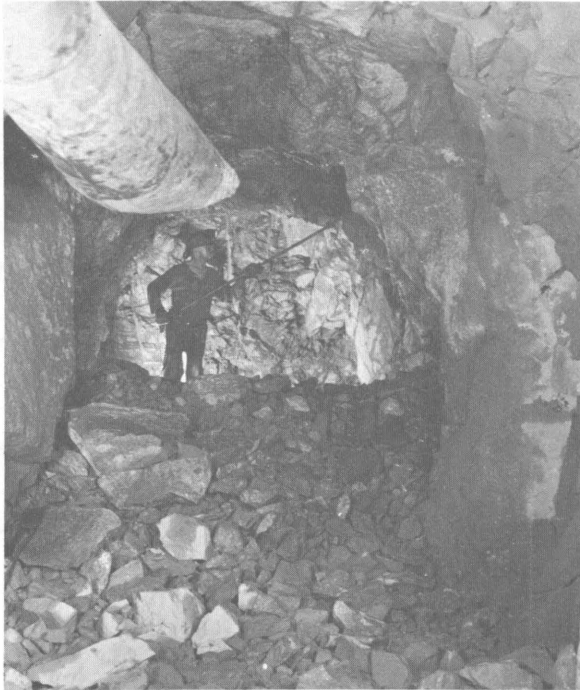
Blasted Rock (Muck Pile) in a Development Heading. (Man at the Face Is Barring Down or Scaling.)
